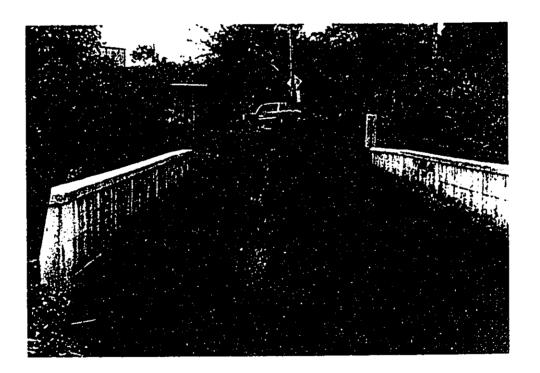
Papaahawahawa Bridge, view towards Kipahulu
